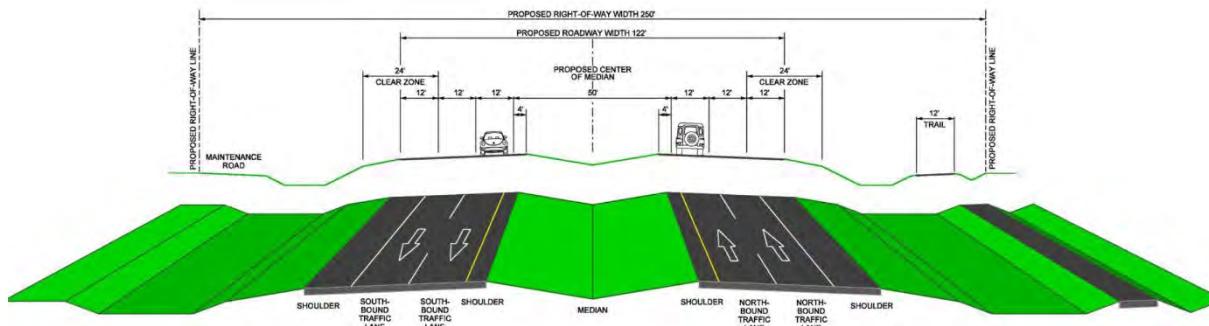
Level 2 Design Cross Sections by West Bypass Alternative
